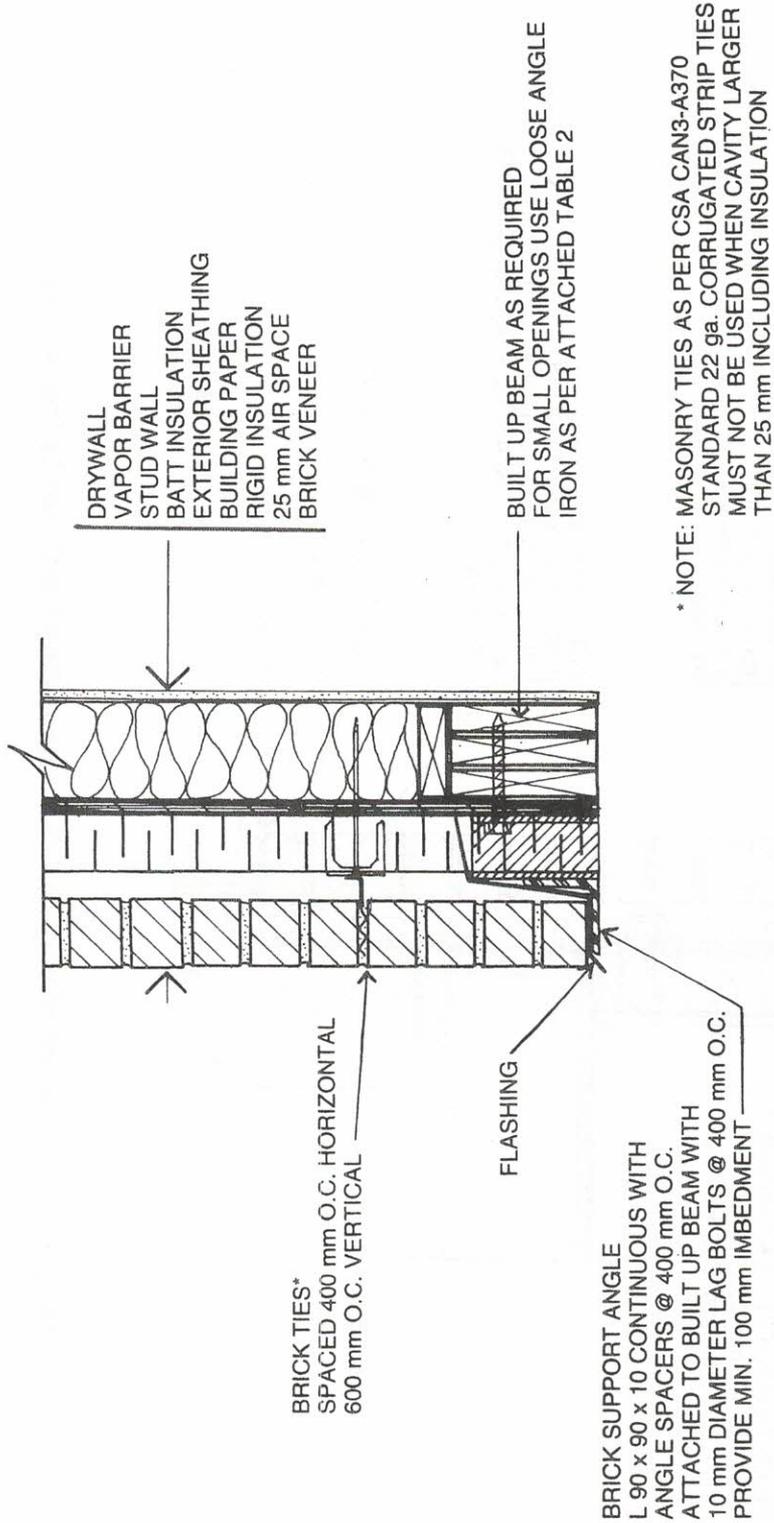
Steel shelf angle brick support detail at stud wall for window openings
